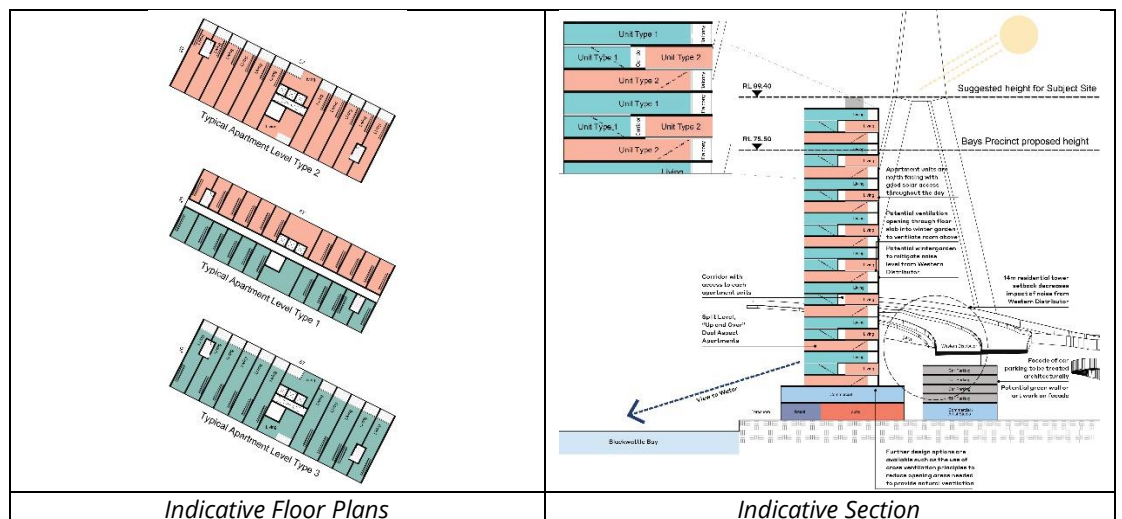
Indicative Floor Plans and Section of the Poulos Bros Bank Street Site
